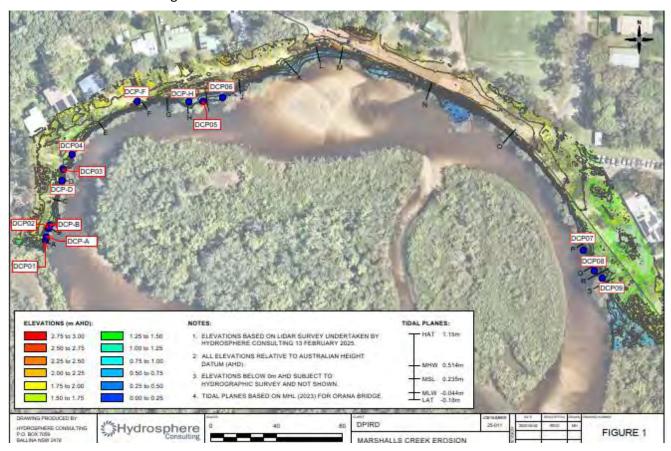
Site Plan with location of remediation work (A - S) and DCP locations overlain
